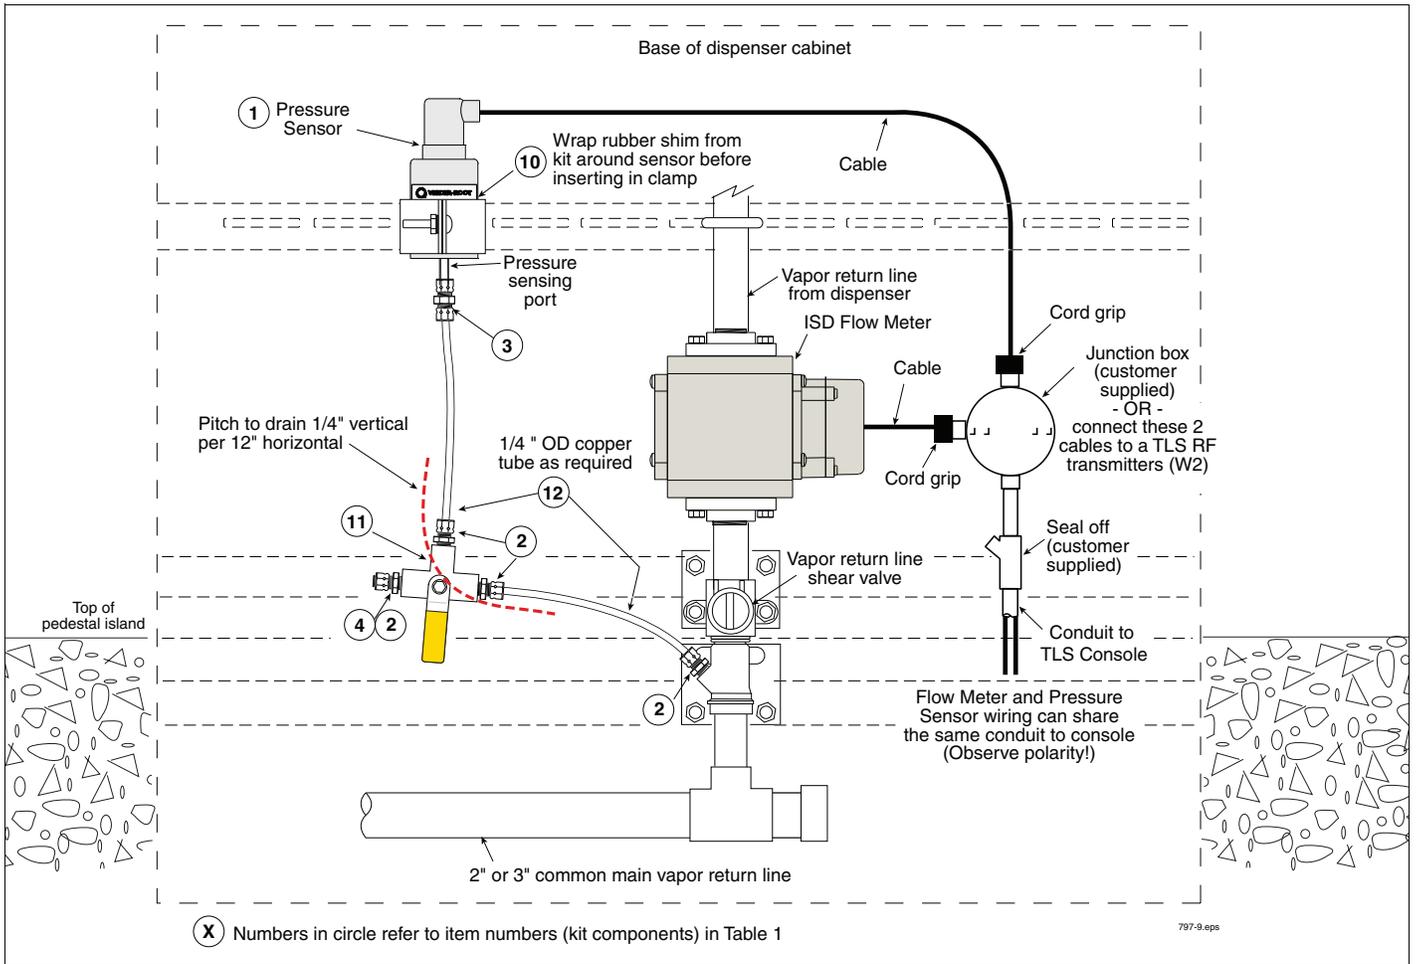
Example Pressure Sensor Install In Shear Valve Port - Preferred ISD Installation (With Vapor Flow Meter Above Shear Valve)
